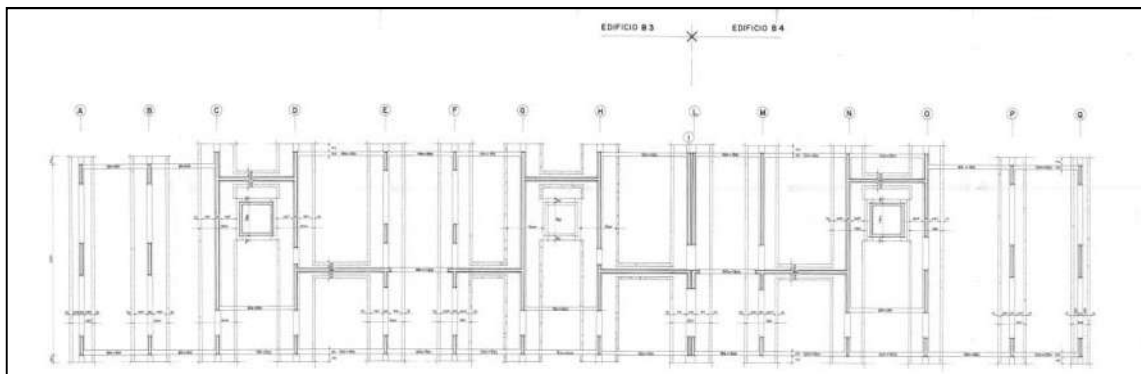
Foundation Plan Building B-(F106.2T33_STRUCTURAL).
